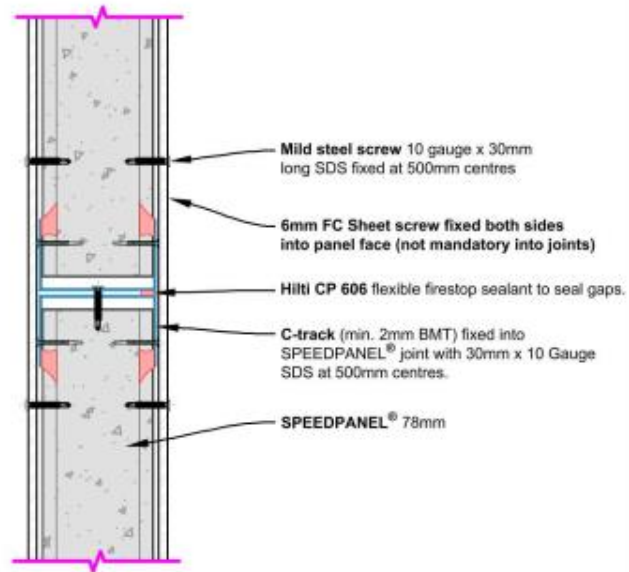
A: Back to Back C-tracks- Connections at Landing - Alternative-1
